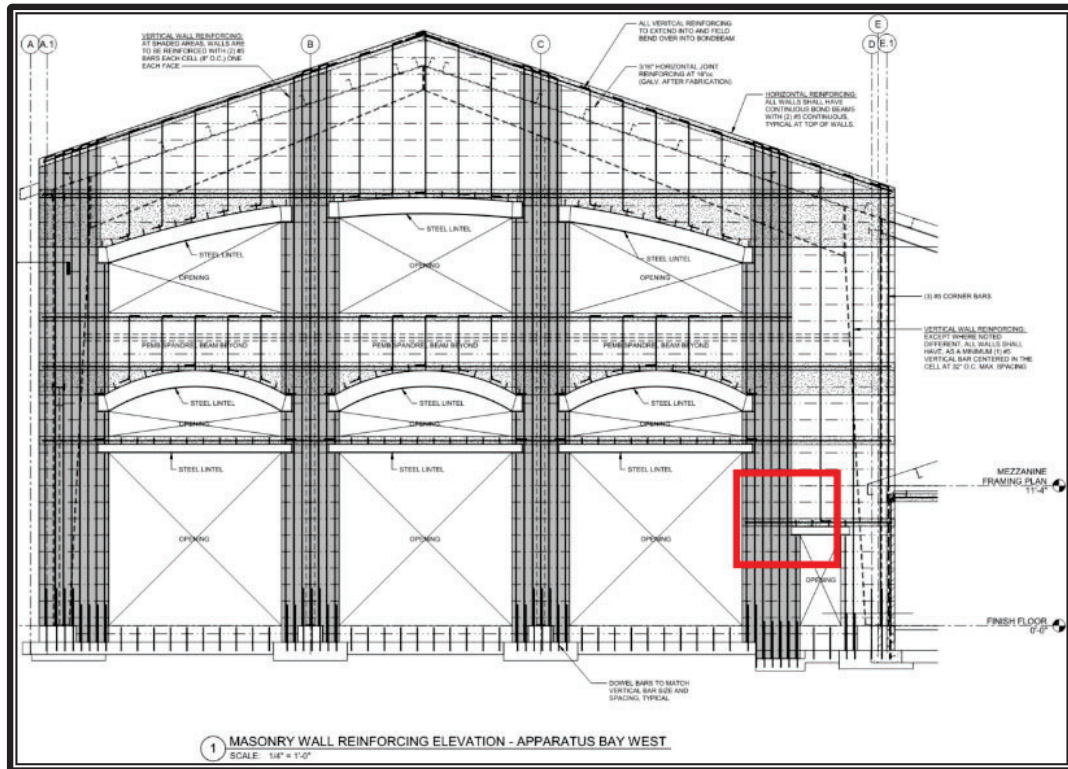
CMU wall elevation showing the approximate location of Test Area 3 (outlined) (cropped plan courtesy of T&V).
